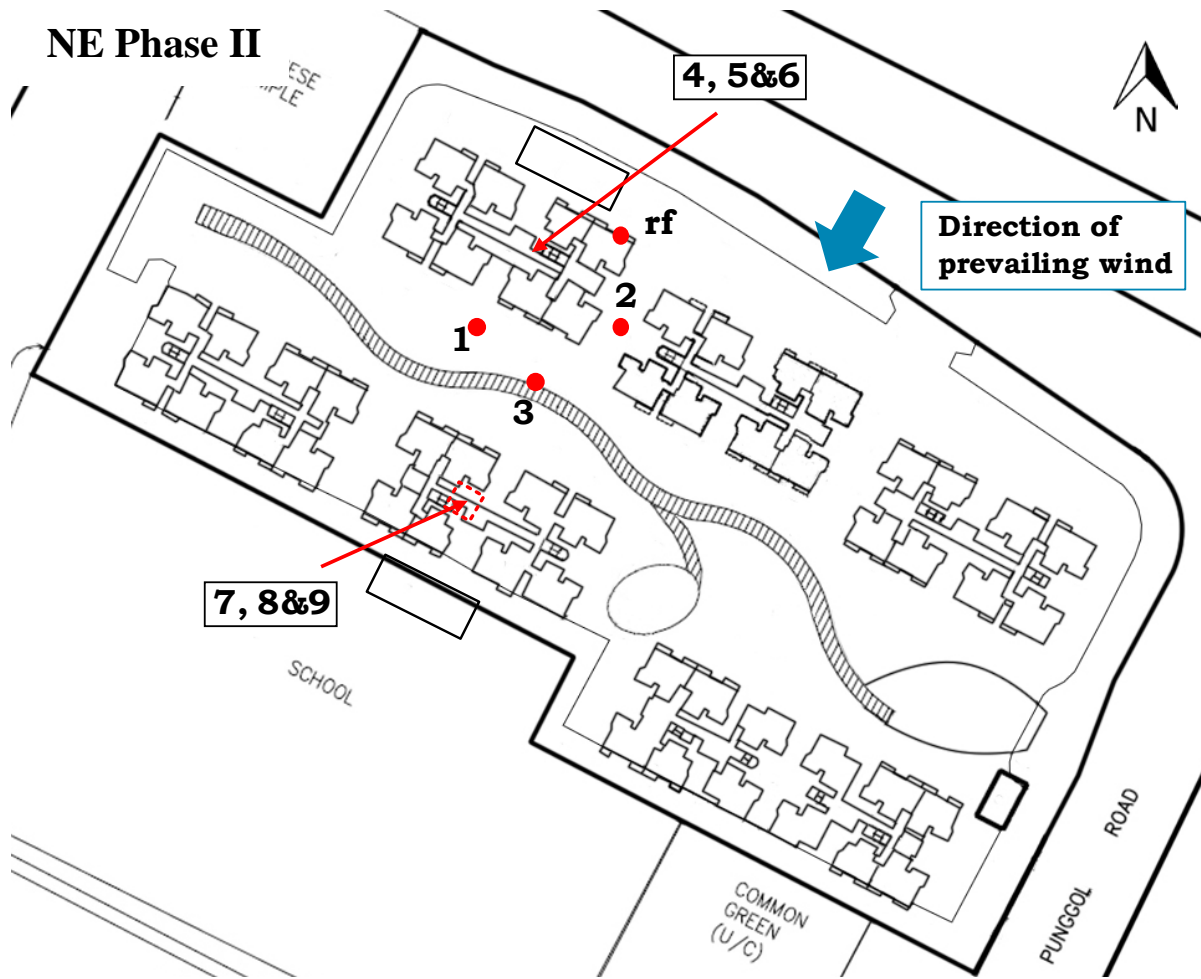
Sensor layout in NE Phase II measurement. The Station *rf* is on the roof of Block 306C. Stations 1 – 3 are on the eco-deck level. Stations 4 – 6 are installed at the 3rd, 9th and 15th floor of Block 306C respectively. Stations 7 – 9 are installed at the 3rd, 9th and 15th floor of Block 306B respectively.
